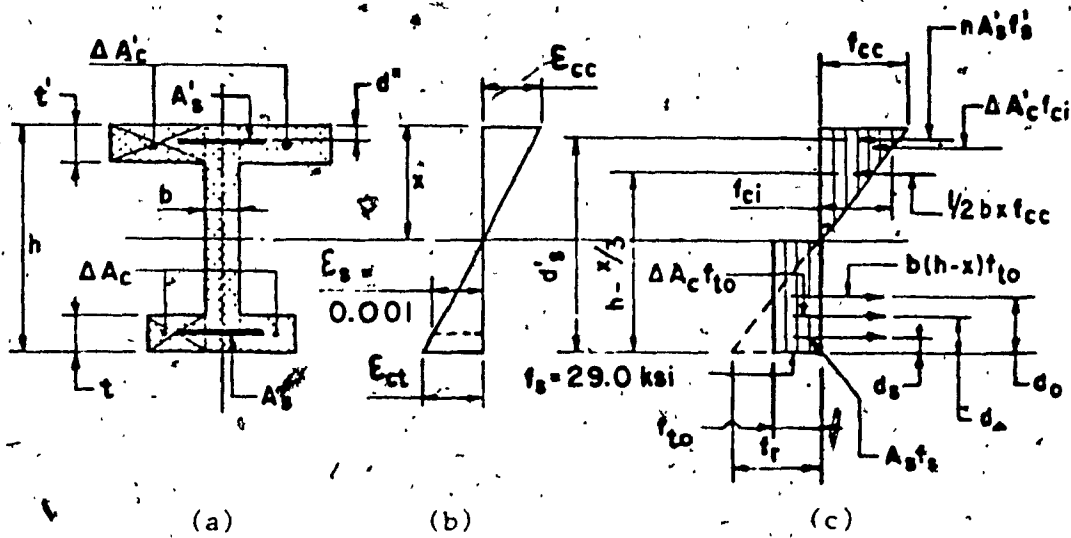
Generalized I-shaped section at cracking: (a) cross-section;
